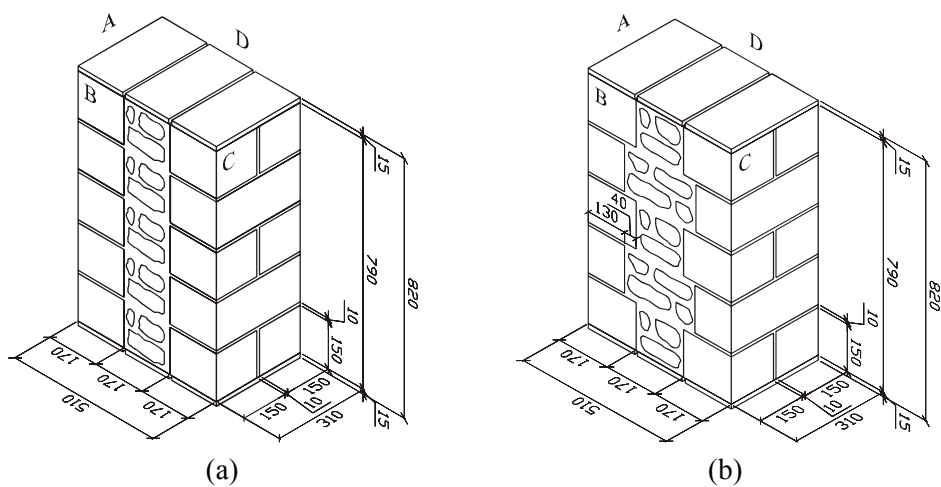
Wallets dimensions in mm: (a) straight collar joints and (b) keyed collar joints.
